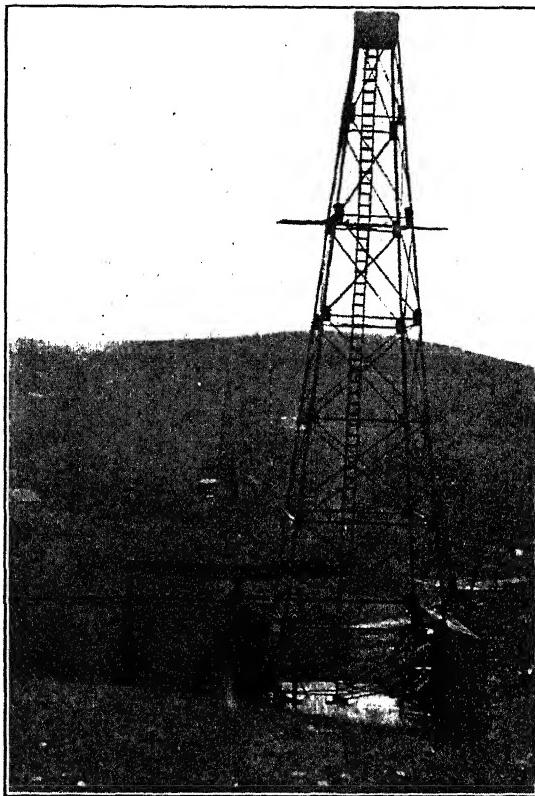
LONG-PANEL STEEL DERRICK, 1903. BUILT BY CARNEGIE STEEL CO. ERECTED BY SOUTH PENN OIL CO., SHINNSTON, W. VA.
